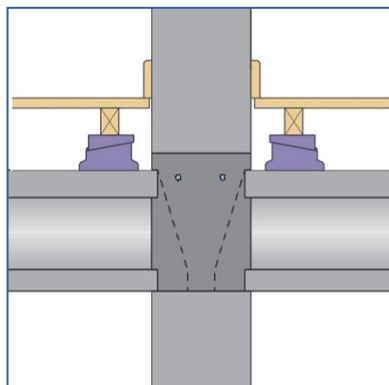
Example of Danish heavy wall / heavy floor construction for new apartment houses fulfilling the Danish Building Regulations 2010 [4].
